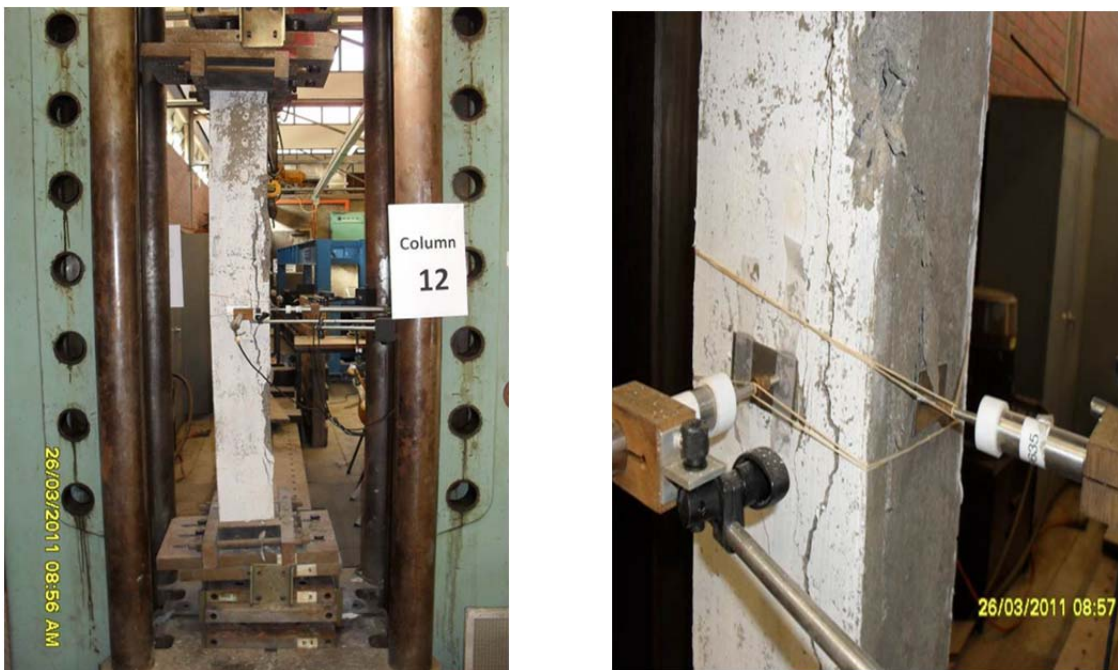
Failure mode of column GCIV-C3: (a) column after failure; (b) closer view of failure section
